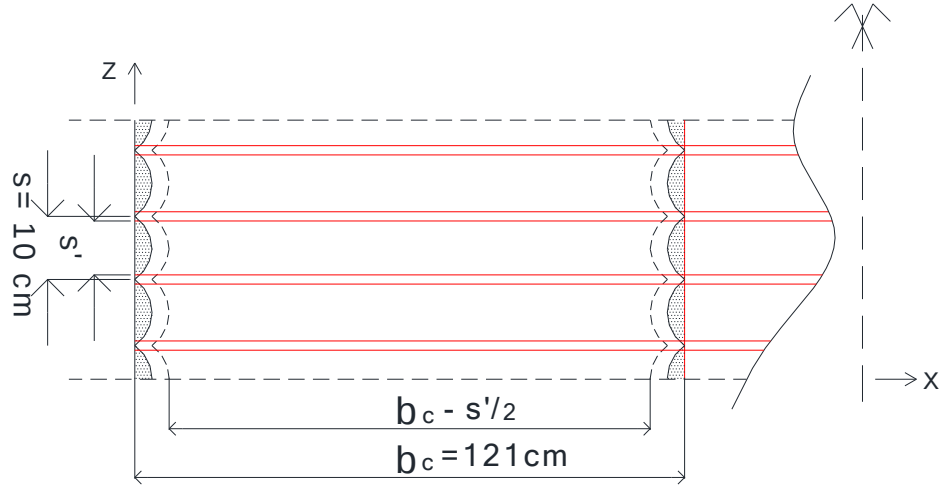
A vertical section of RC shear wall at ground floor.
